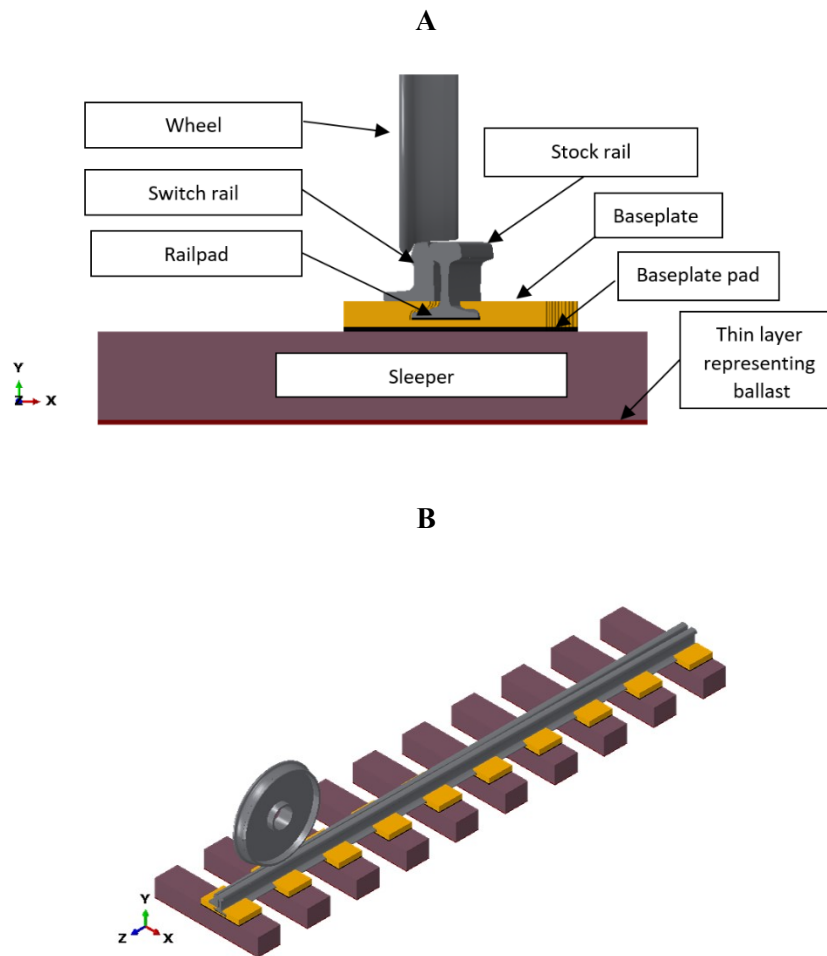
Assembly of the track model along with the wheel; (A) Front View; (B) Isometric view.
